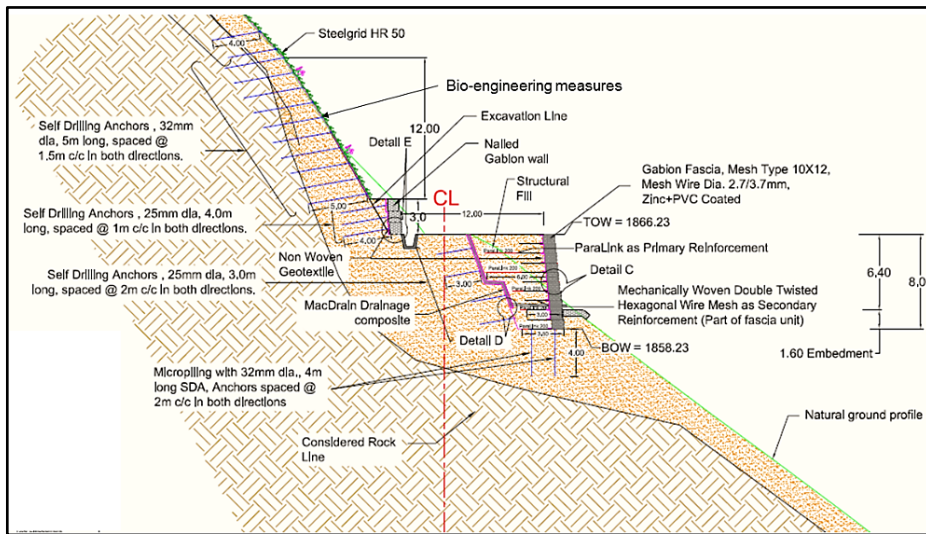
Reinforced soil wall with secured drapery on hill side and nailed gabions to arrest rockfall (schematic sketch, not to scale)
